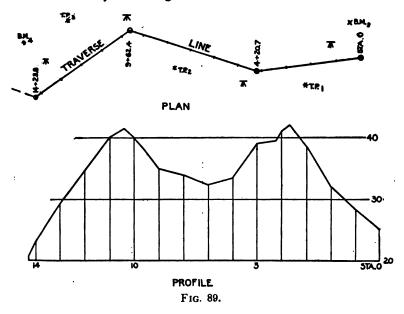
represents a rough plan and profile of the line of levels shown by the notes in Fig. 88. Angle points in the transit line are shown in the plan, but they do not appear in the profile of the line. It will be noticed that the T. Ps. and B. Ms. are not on the transit line in plan, and that they consequently do not appear on the profile. It is not customary to introduce
